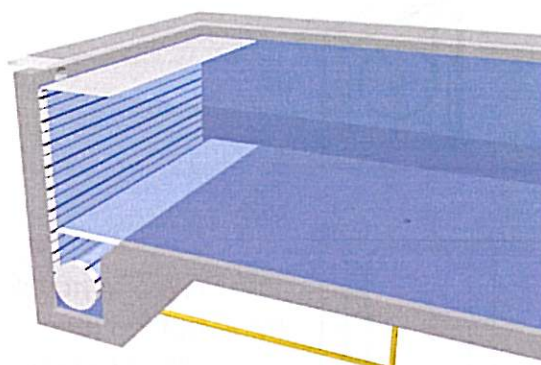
/F: installation of the cover underneath the bottom of the pool with a removable lid
